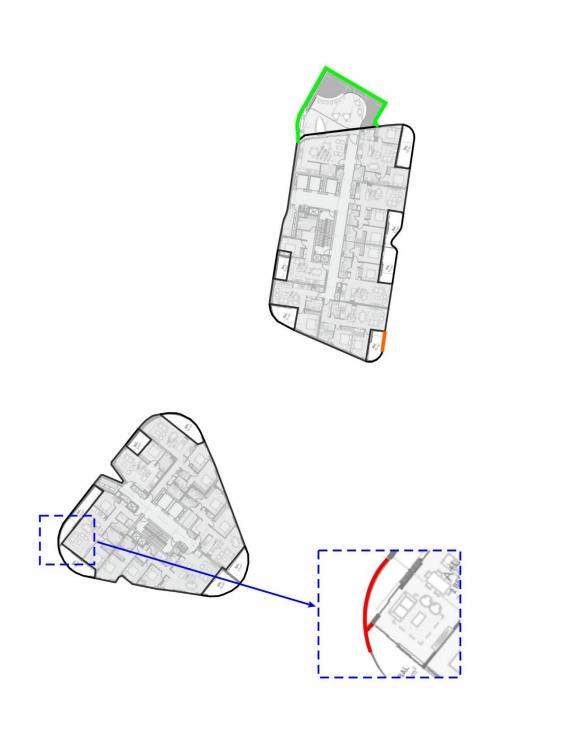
Suggested Retention of Architectural/Landscape Elements – Level 17
